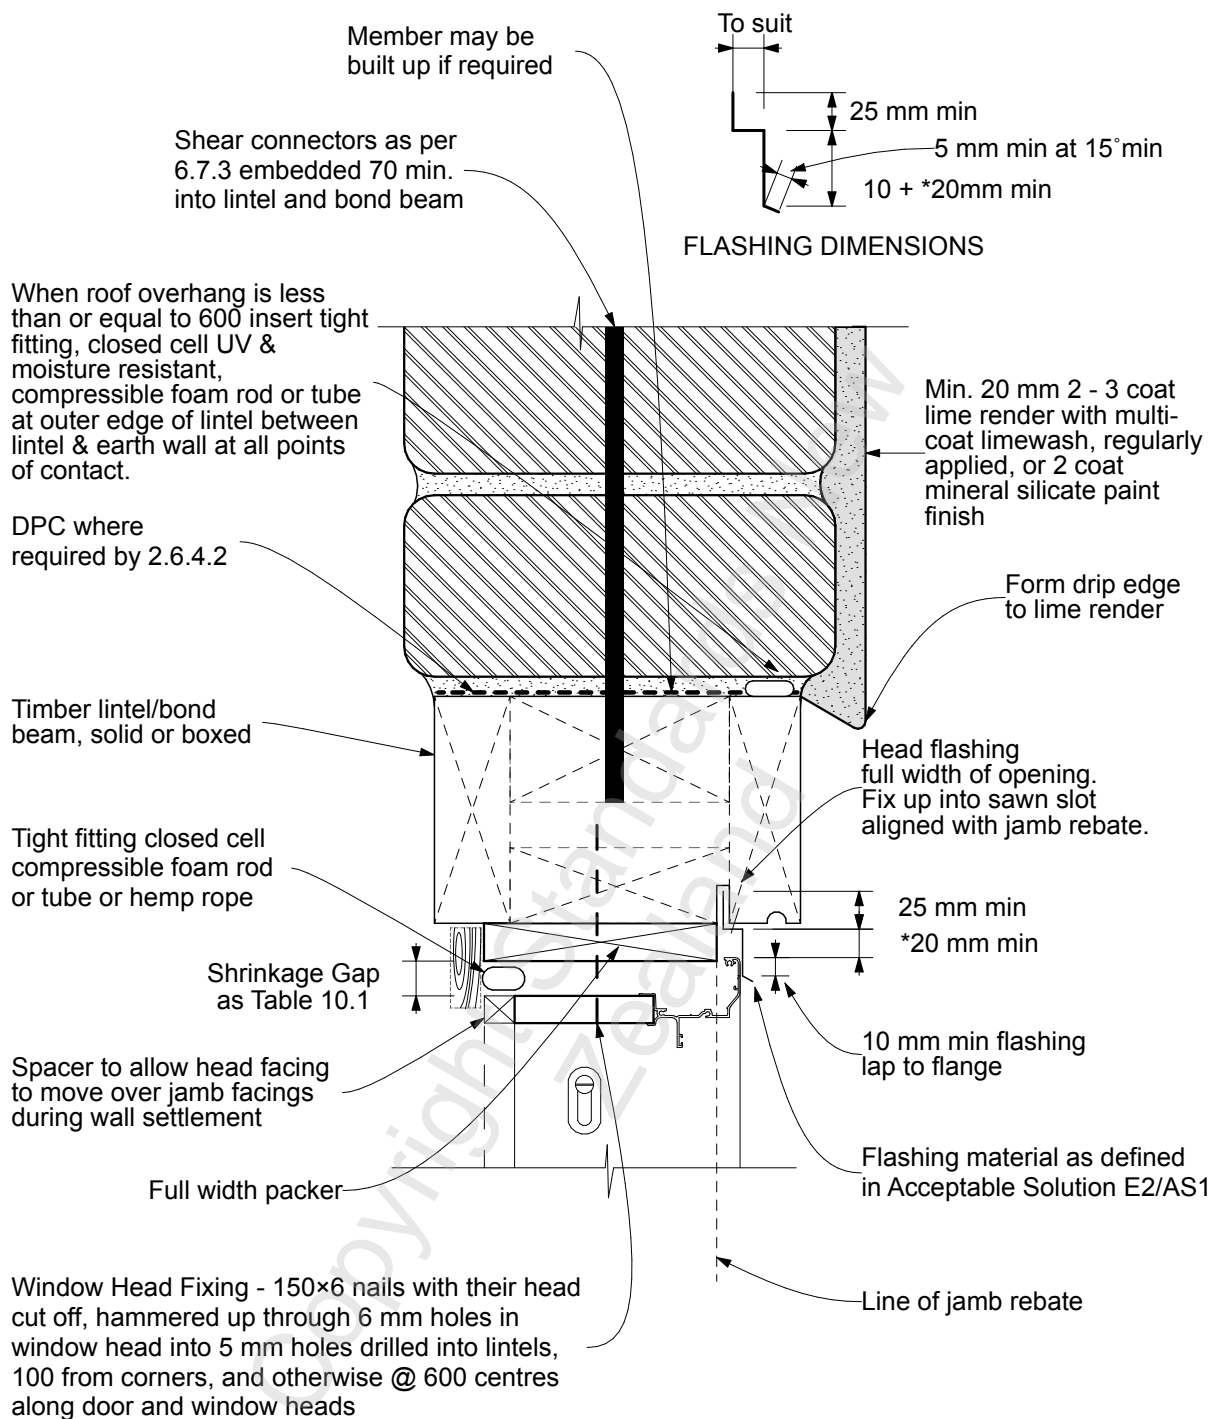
Aluminium joinery head for lime plaster over solid earth wall
